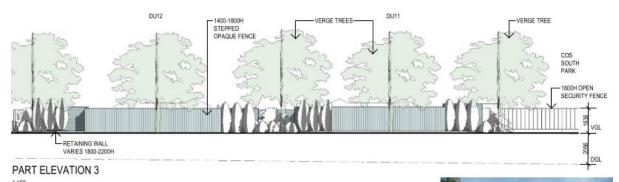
Streetscape presentation to Swansea Road Part 3 elevation
